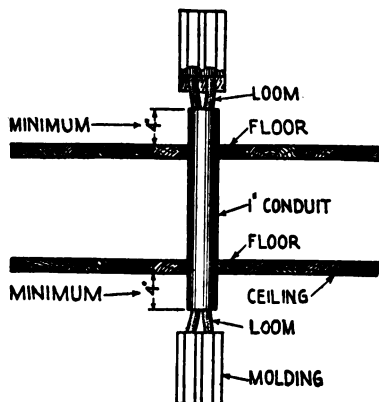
,983.—Wooden moulding wiring passing through floors. *1st method.* The wires are encased in loam and further protected by a conduit. Note that conduit must extend 4 ins. above floor and 4 ins. below ceiling.
